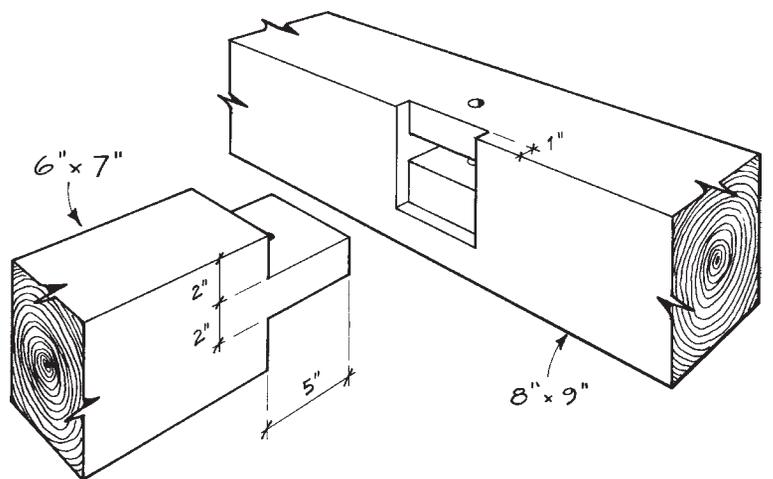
Heavy aisle loft joist in a pre-1820 Dutch barn in Root, N.Y., part of a set spaced 5 ft. on center with their outboard ends tenoned to posts.
